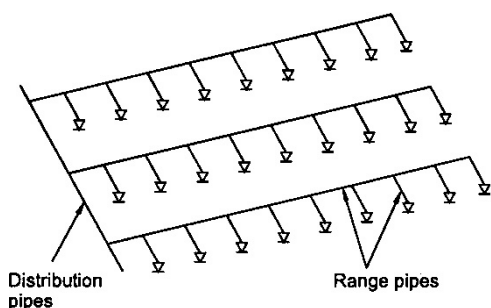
OH and HH pre-calculated installations - arm pipes and risers (or drops)
